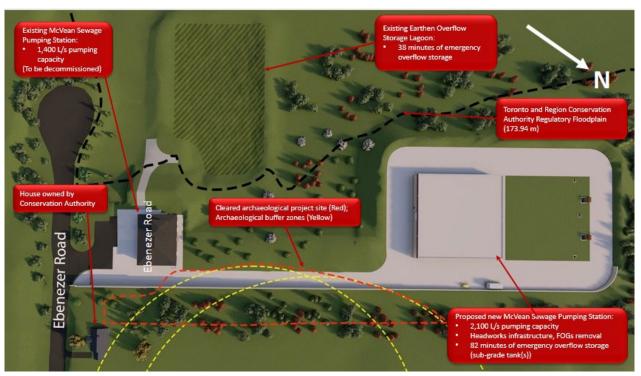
Alternative 4 Layout – New SPS, complete with In-Tank Emergency Overflow Storage, Existing Earthen Lagoon (to remain)
